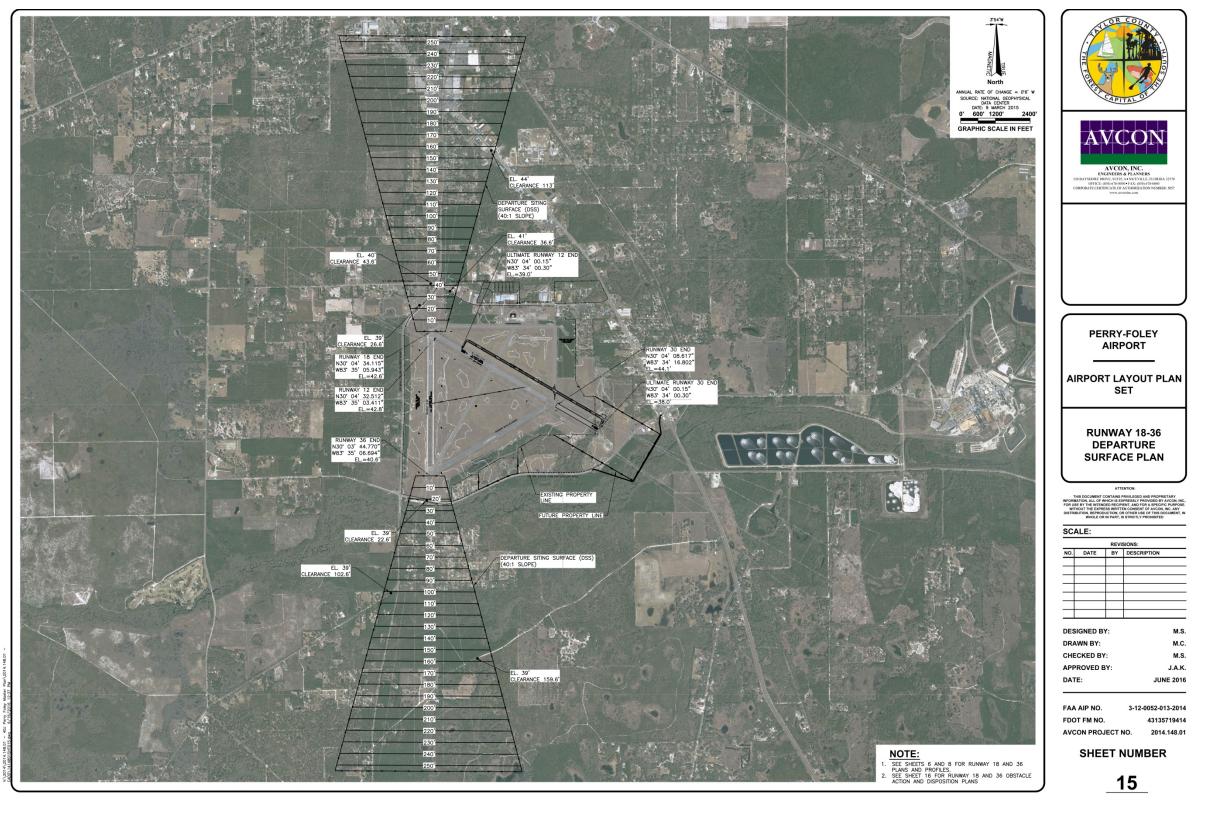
RUNWAY 18/36 DEPARTURE SURFACE PLAN
